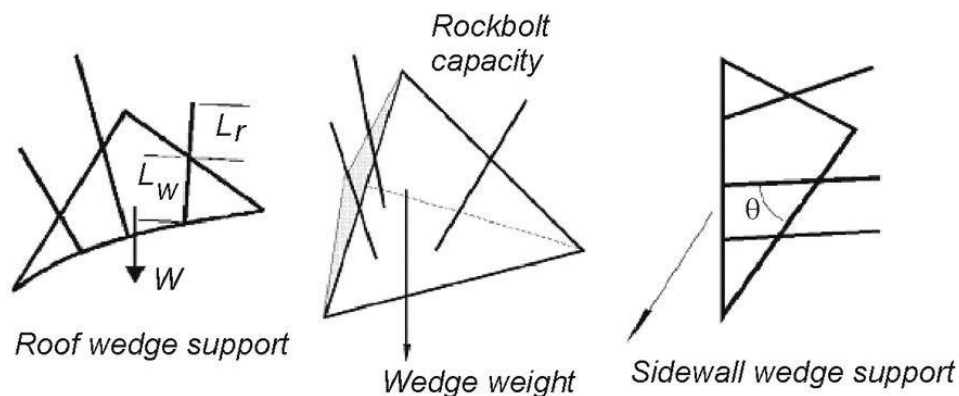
Rockbolt support mechanisms for wedges in the roof and sidewalls of tunnels
